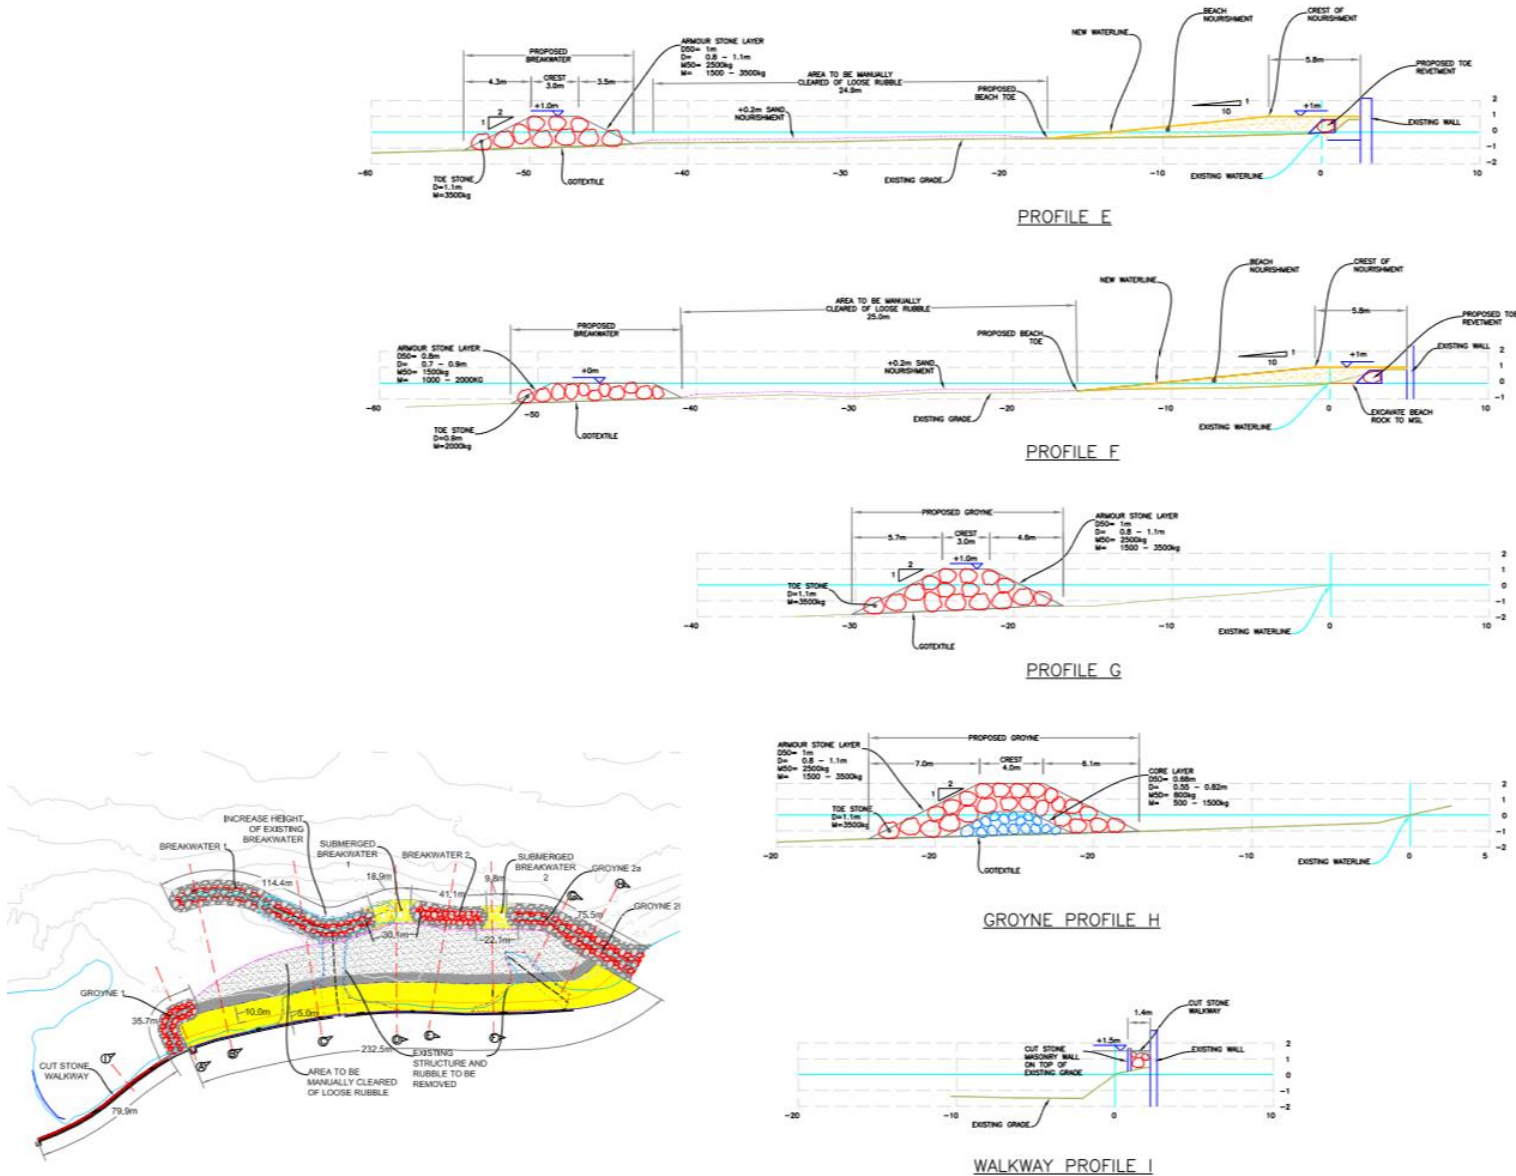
Cross-sections of the proposed breakwater system and beach nourishment; plan of proposed structures shown in left window
